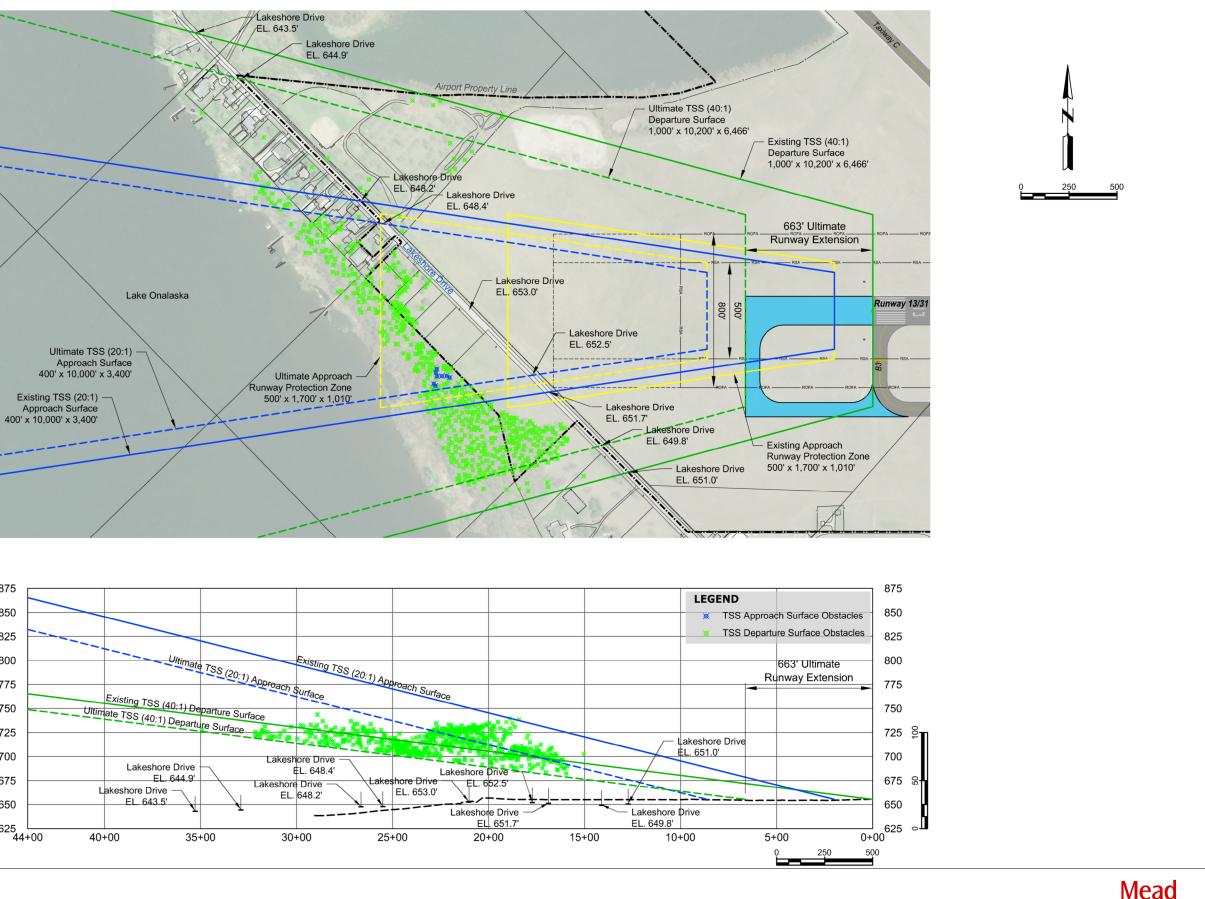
Runway 13/31 Alternative 2: Runway 13 Detail
